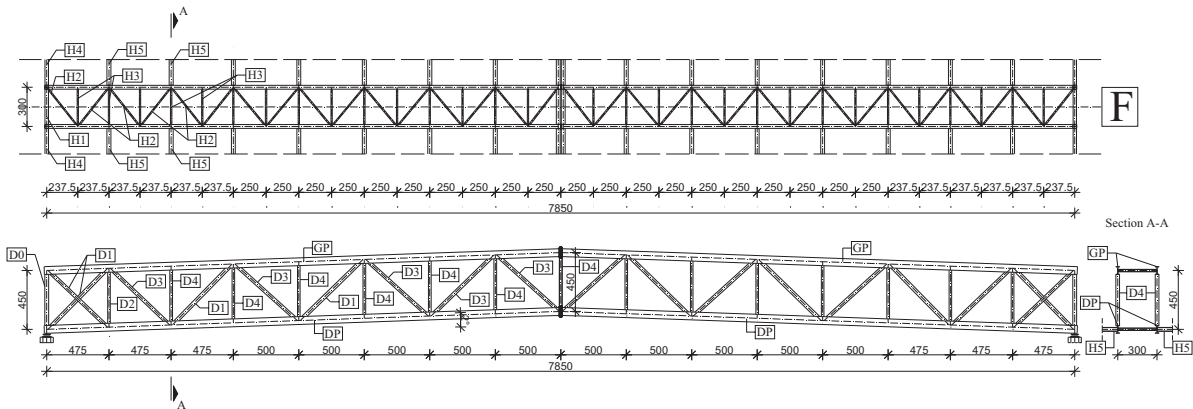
Longitudinal and transverse cross section of the lattice girder section
